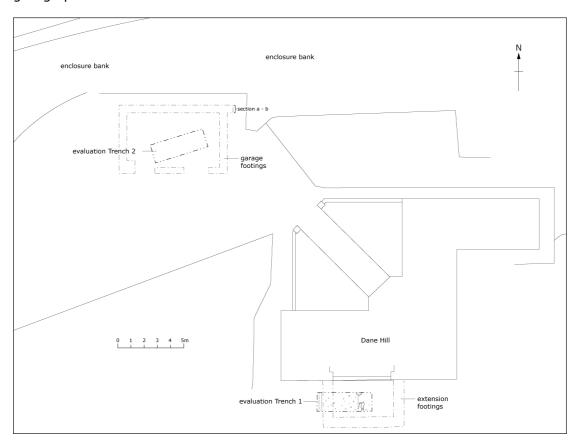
Overall site plan showing location of evaluation trenches and new footings.
